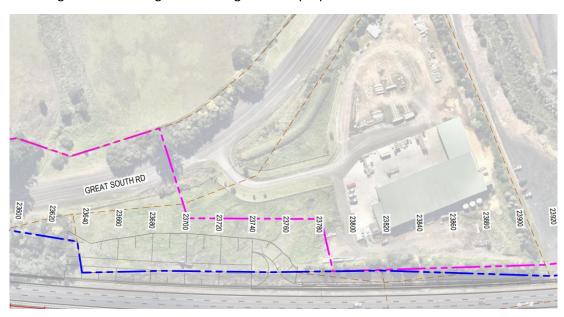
extract from Designation Layout Plans Sheet 13 showing submitter's land and general arrangement of works.
